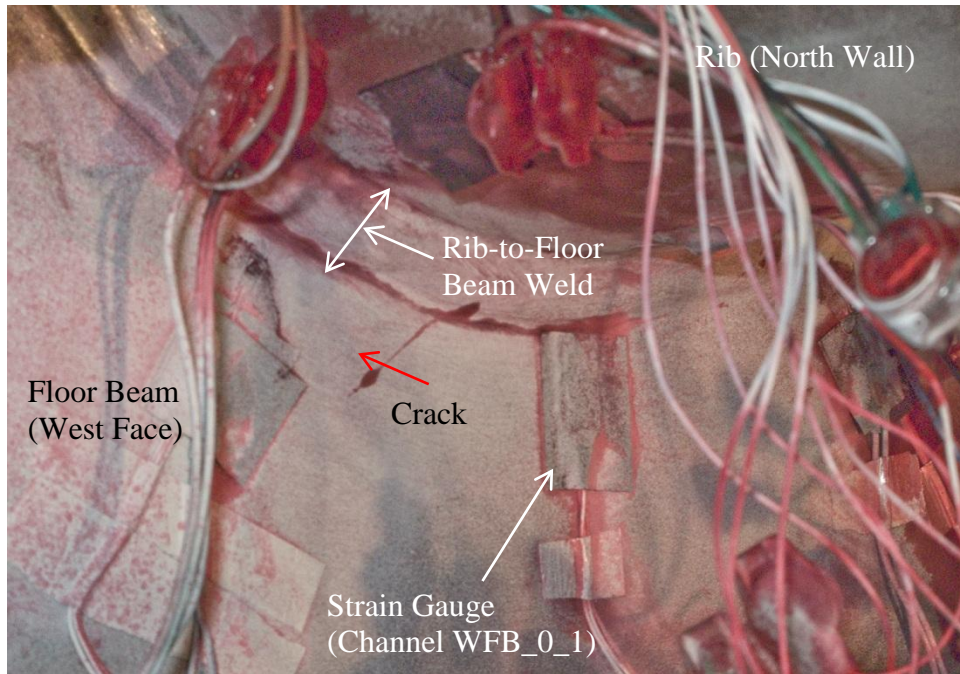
Crack at the floor beam-to-rib welded connection in the mock-up specimen MU2 – north west
